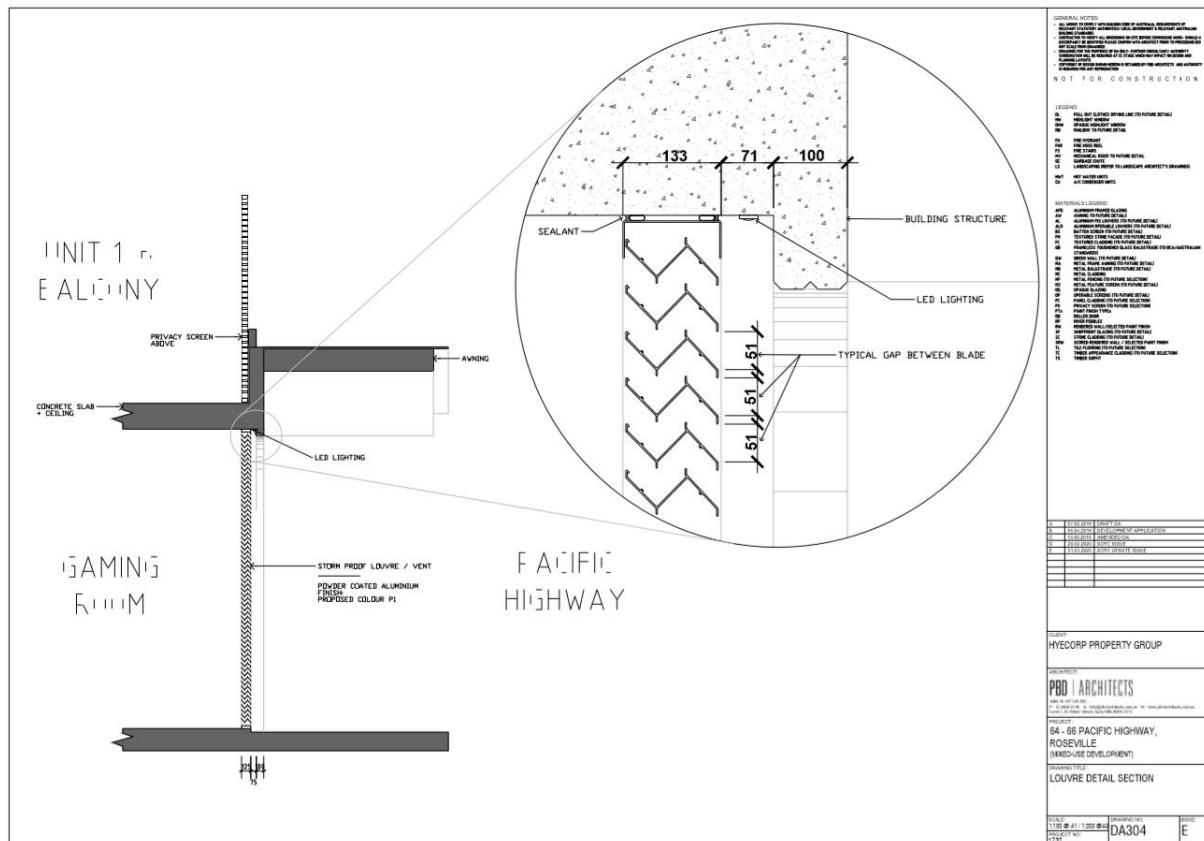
Gaming room louvre details. (Source: PBD Architects)
